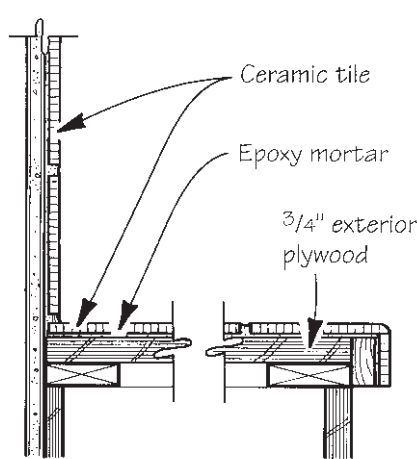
For dry, light-duty counters, $3/4$ -inch exterior-grade plywood will work as a tile underlayment. Avoid pine plywoods; the pitch acts as a bond breaker, according to the author.
